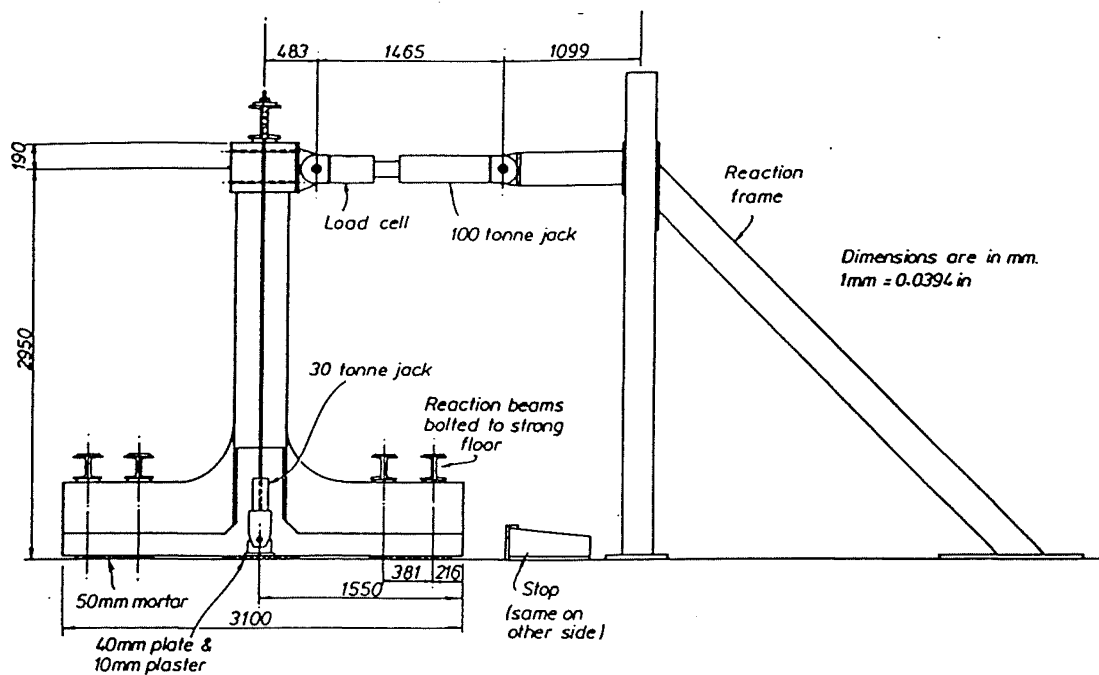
Test set-up for column/crossbeam specimen [Park et al 1993].
